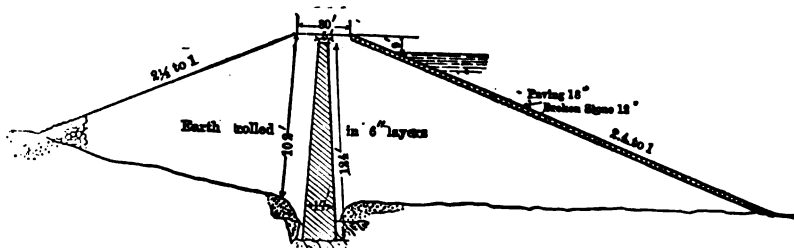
Cross-section of Titicus Earth Dam, New York.
